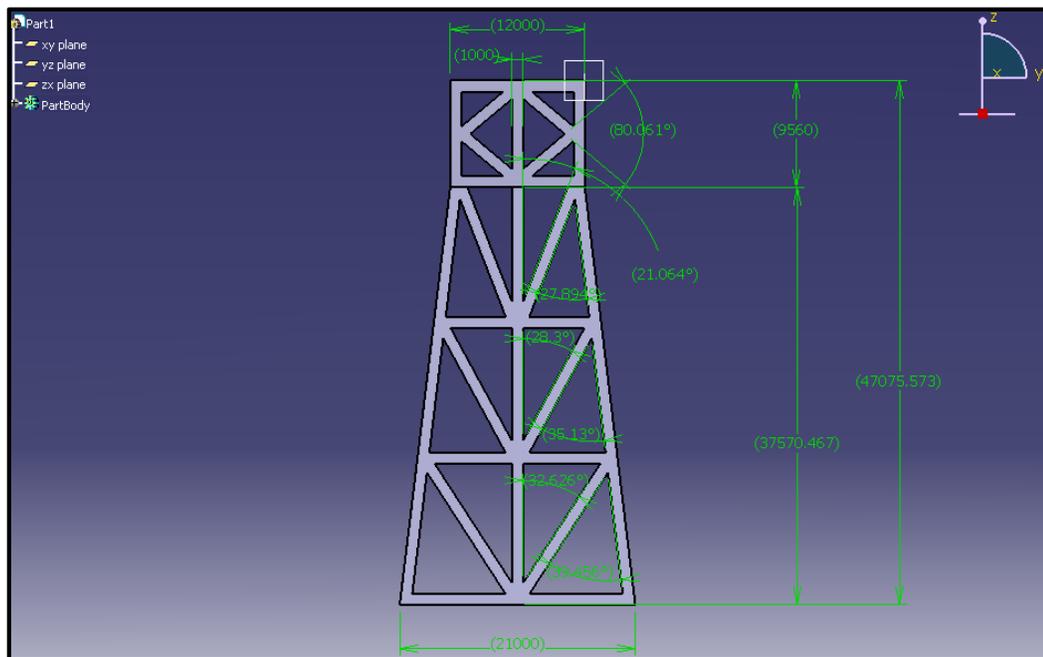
Jacket Structure drawing with 1 m x 1 m cross-sectional area of steel members with dimensions.
